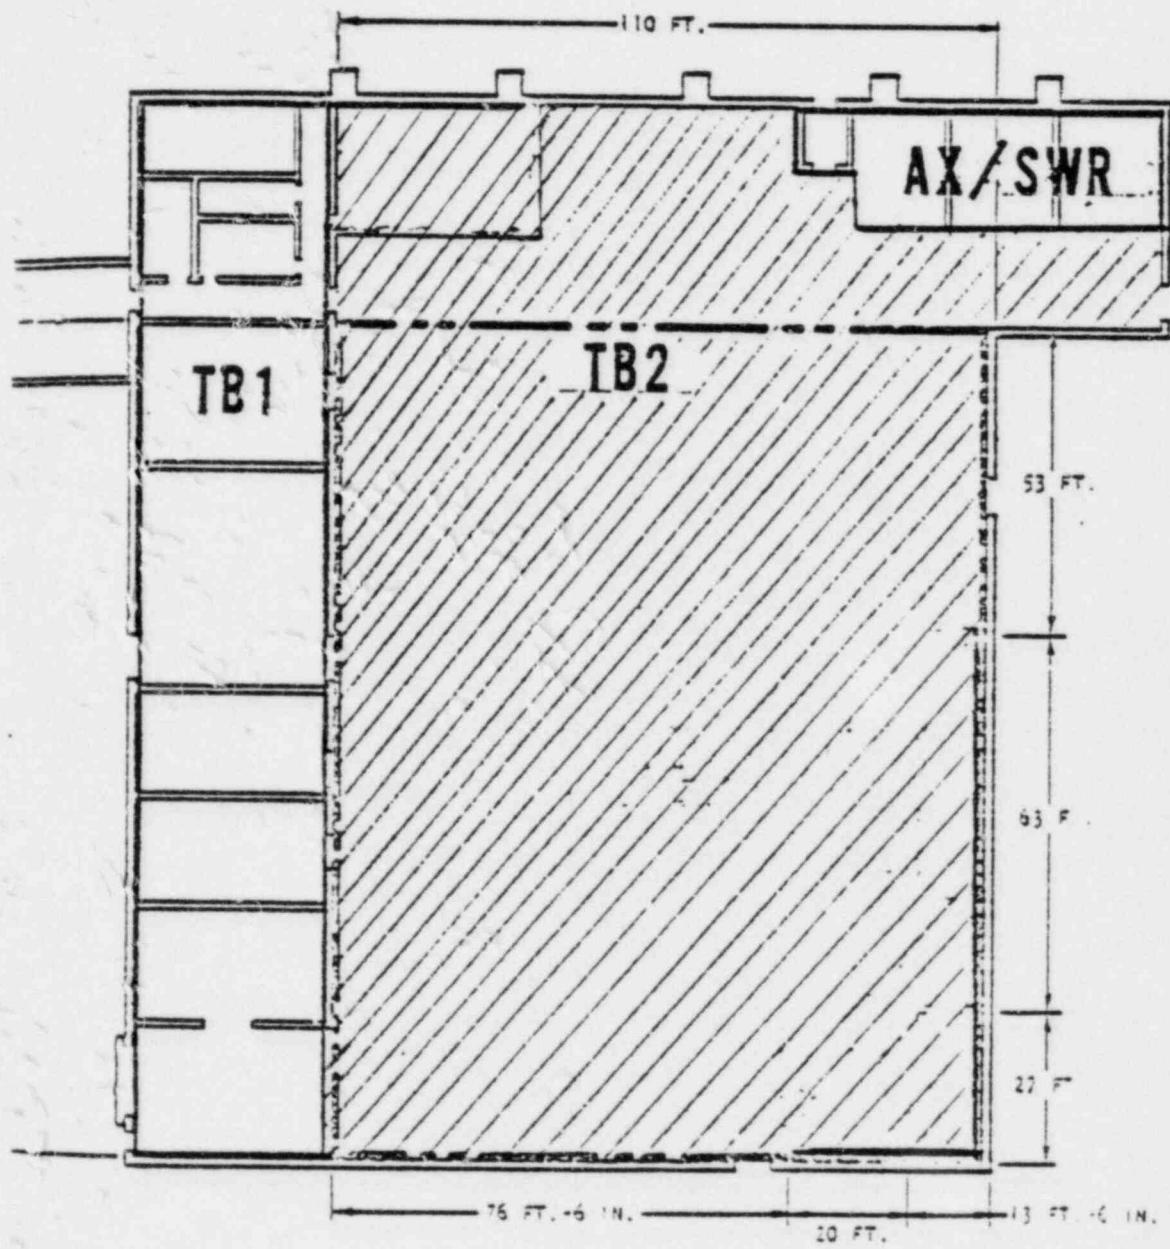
Turbine Building Plan View Below Elevation 4829 Ft. Showing Region of Detailed Analysis
